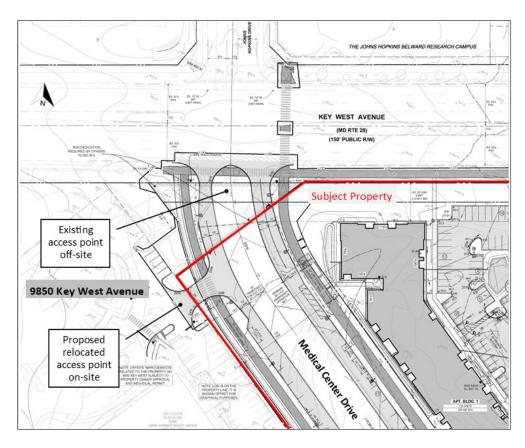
Reconfiguration of the Driveway Access to 9850 Key West Avenue
